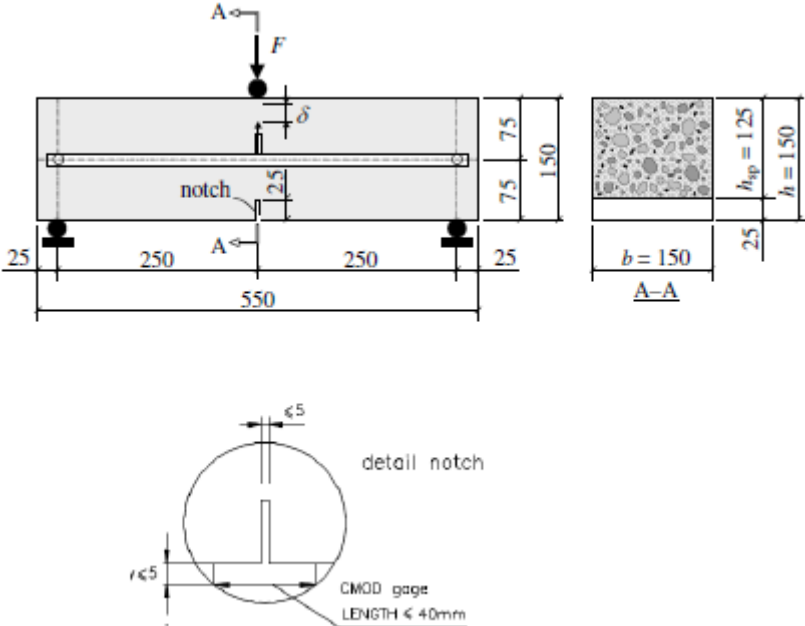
Detailed specimen dimensions, arrangement of displacement monitoring gauges and details of sawn notch
